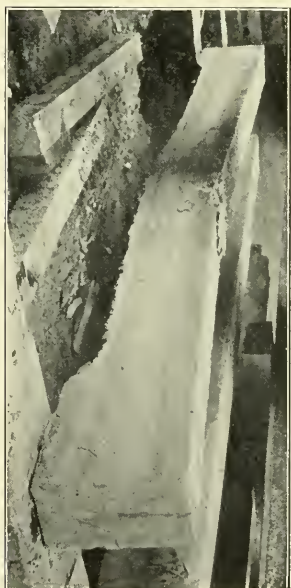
BEAM, 14 DAYS OLD, TESTED BY WRITER, FAILED BY COMPRESSION. NO CONCRETE AROUND TENSION RODS. STIRRUPS USED.
